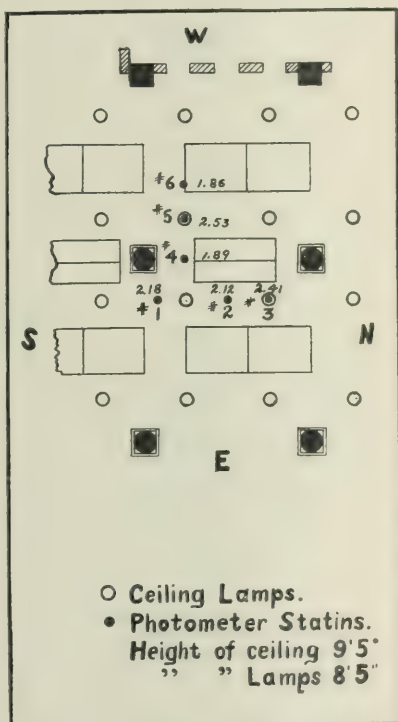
Section of main floor, (ladies' un-trimmed hats), showing location of furniture, pillars, lighting units, test stations and illumination data.
